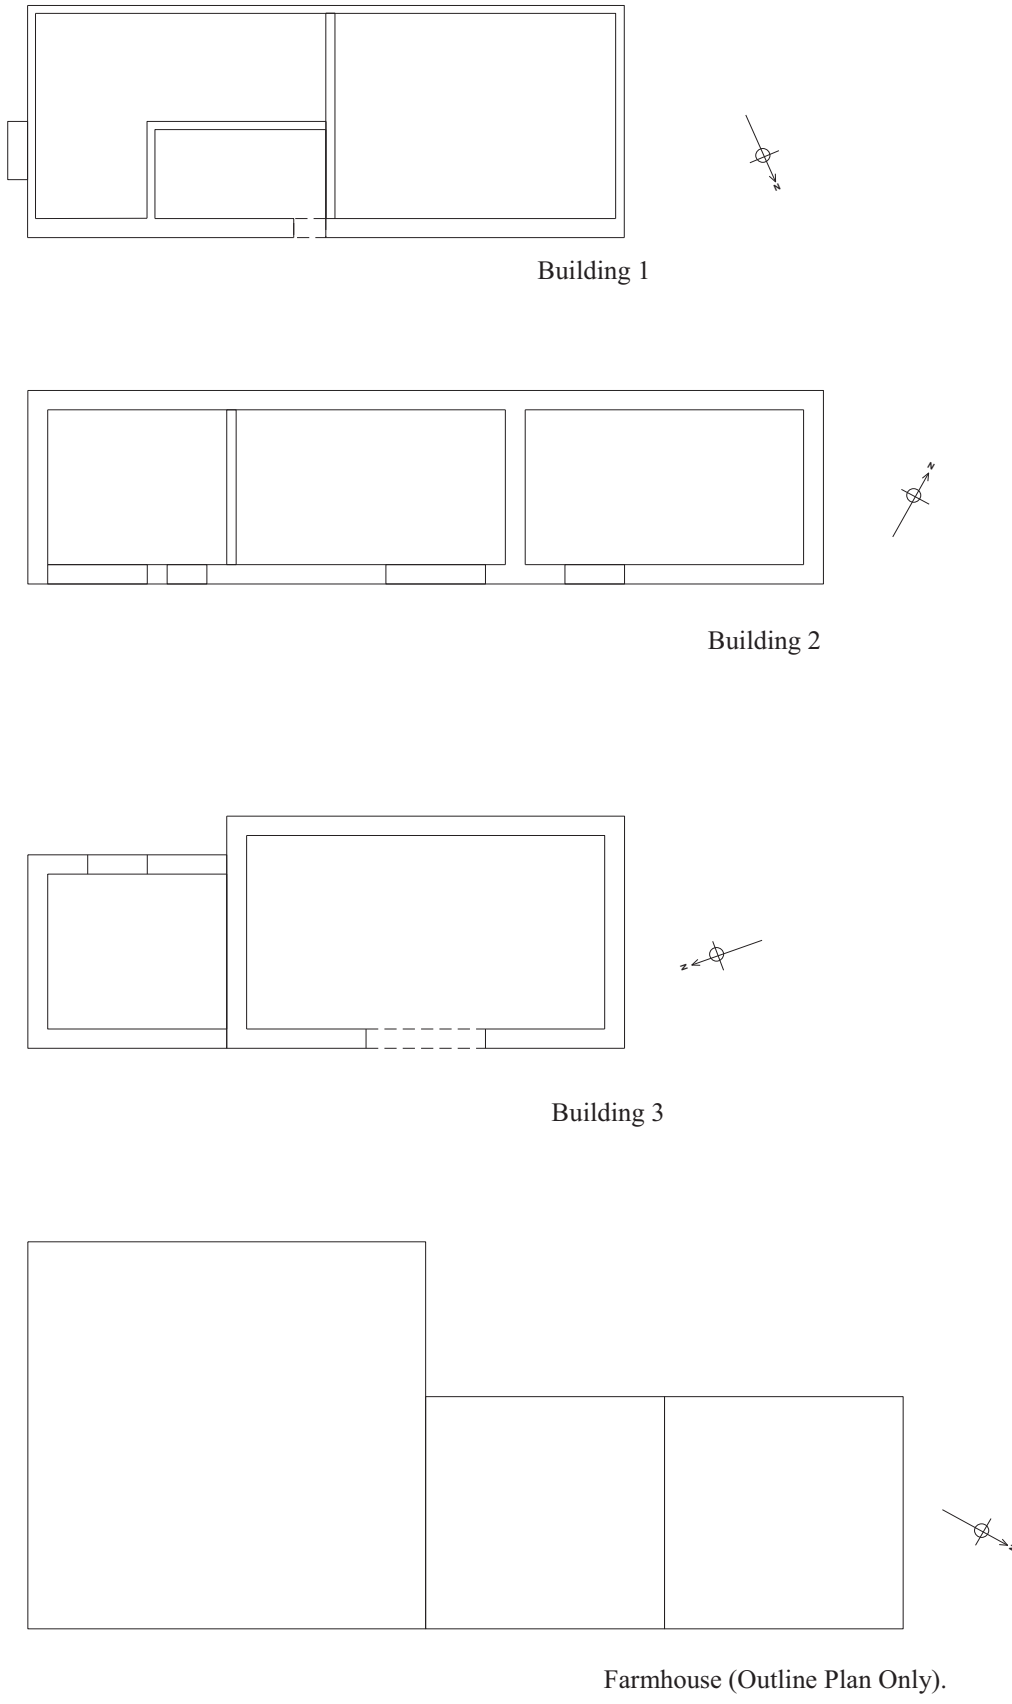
Sketch plan of assessed buildings (ground floor plans only).
